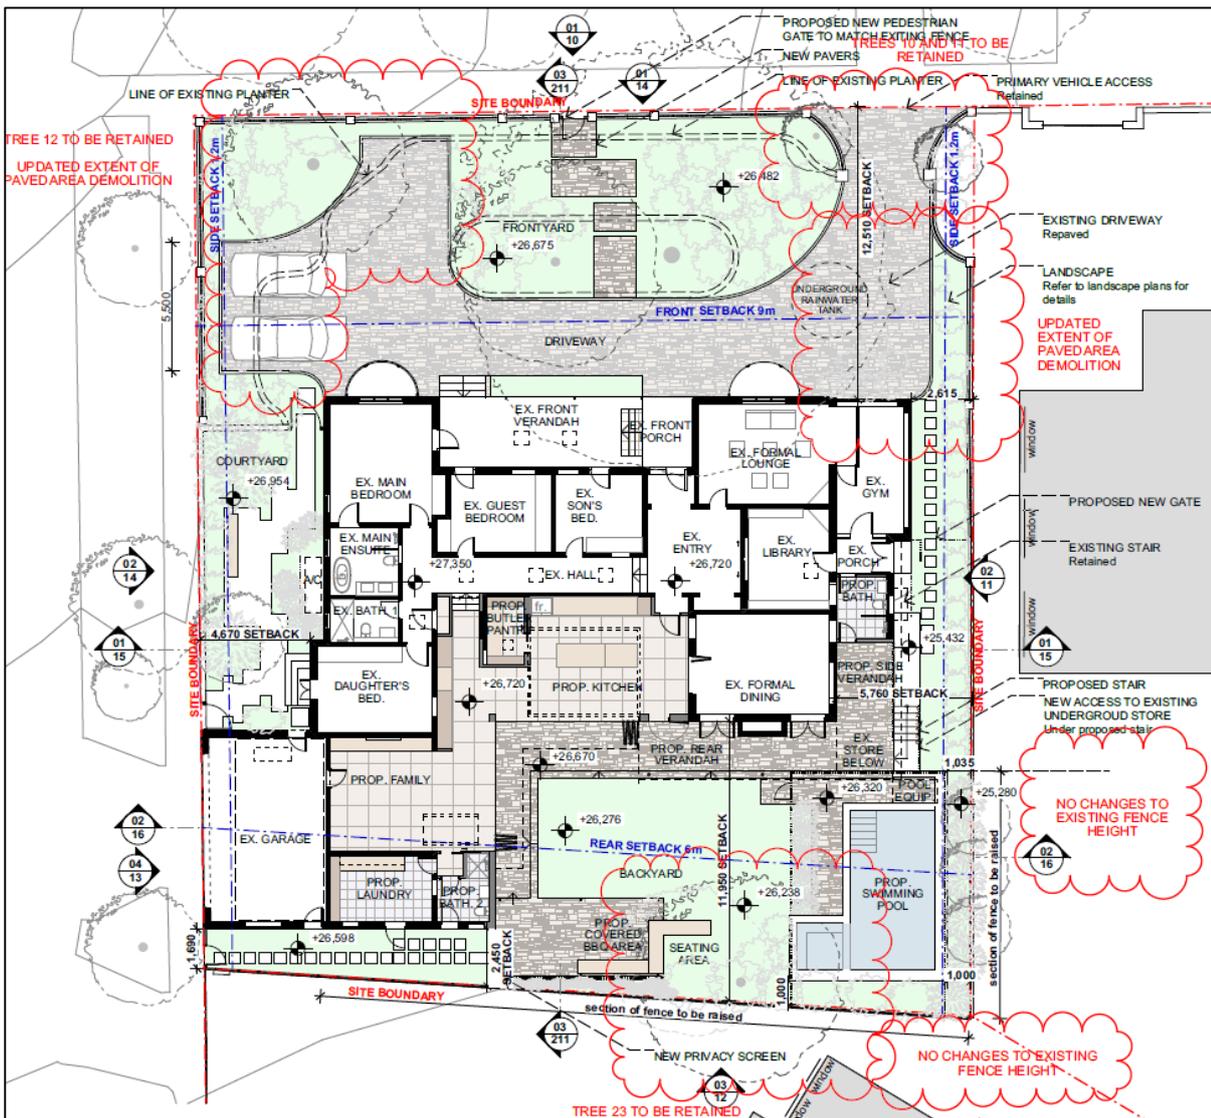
Site plan (internal alterations and rear addition highlighted in grey)
